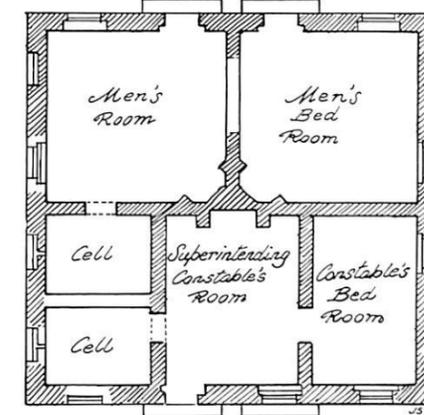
Plan for the water Police stn, Goat Is. Redrawn from Lewis, Plans of Gaols, A/NSW, X 694. walls surviving in 1985 are hatched.
